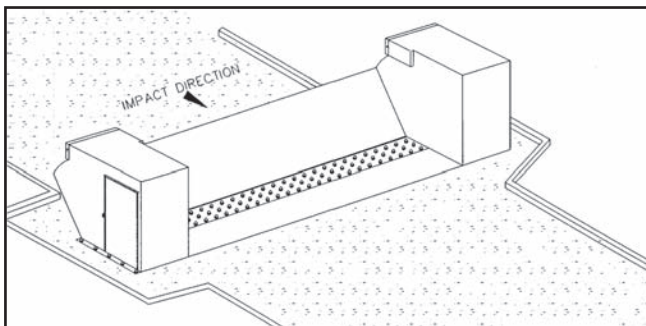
Typical Hydraulic Security Barrier (UFC 4-022-02)
